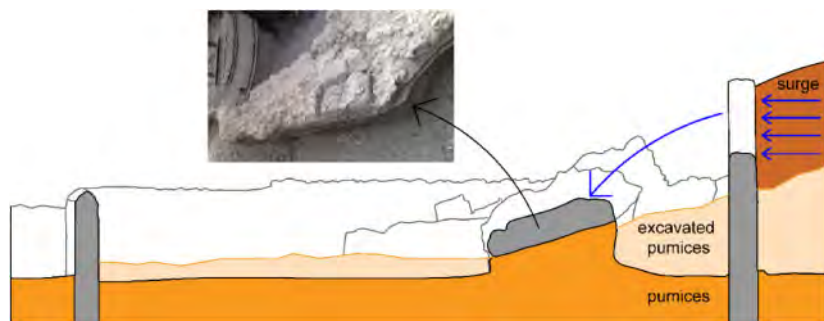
Cross section CC: overturned wall laying on the bed of pumices.
